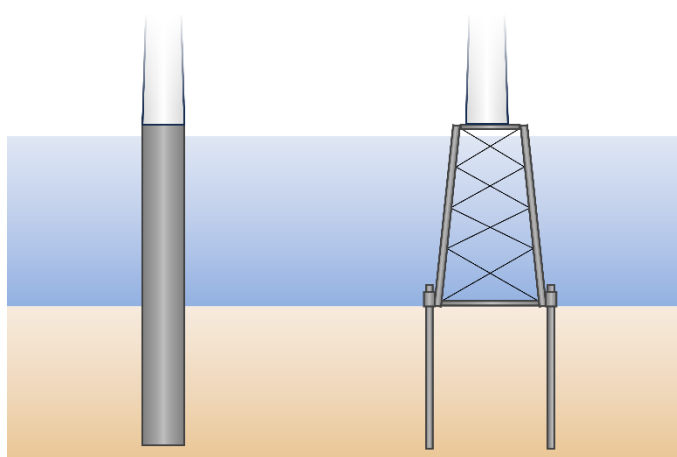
Drawing of monopile foundation (left) and jacket foundation with pin piles (right).
